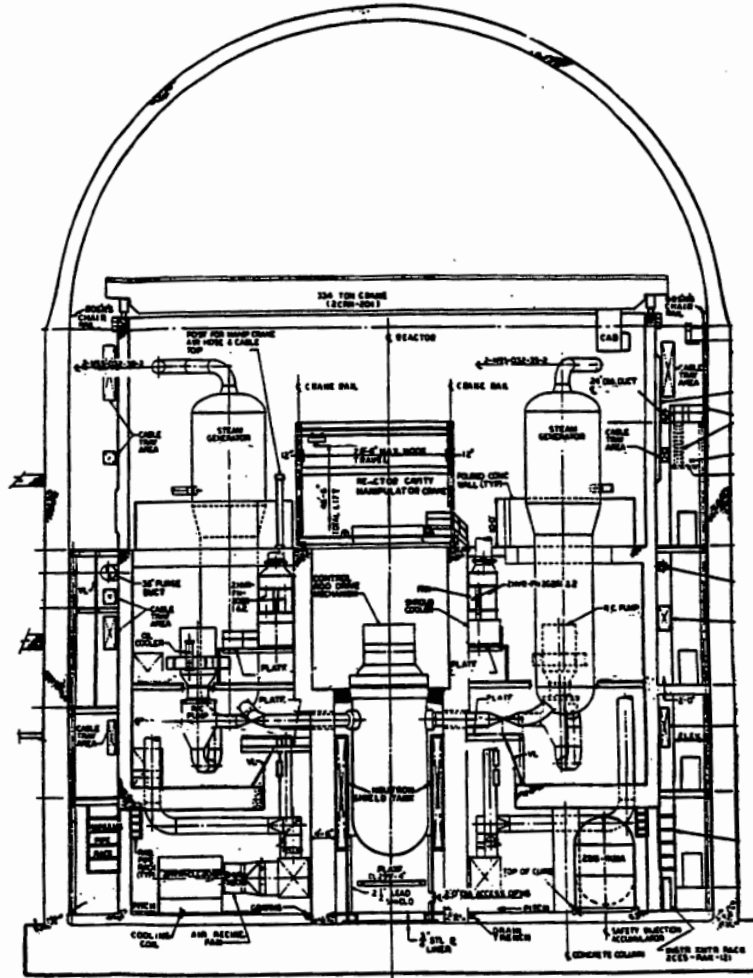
Cross section of 3-loop Westinghouse PWR containment building (Lobner, Donahoe, and Cavallin 1990).
